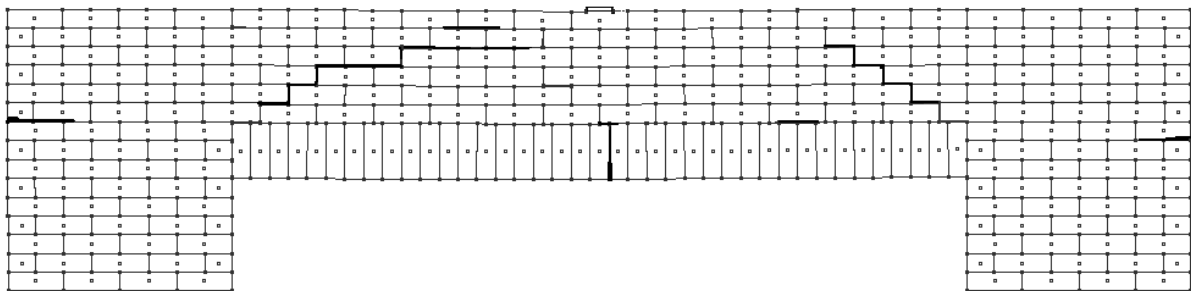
The crack pattern in wall panel L1 at failure, predicted using UDEC.
